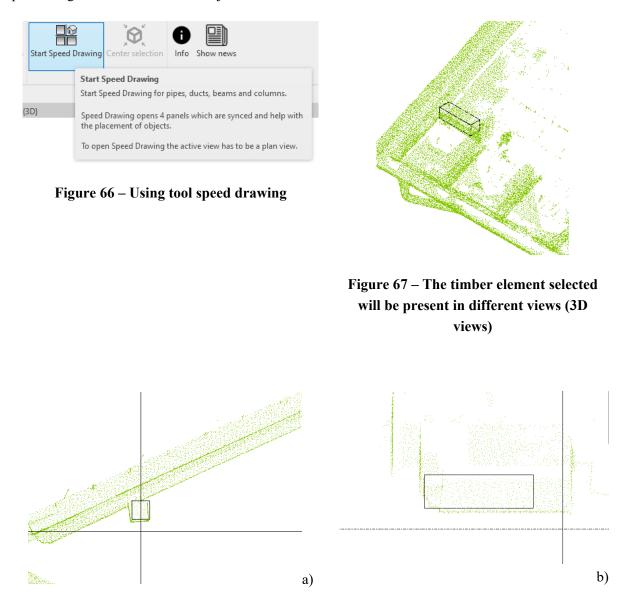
The timber structure selected with different views: a)Elevation view, b) Floor plan view
